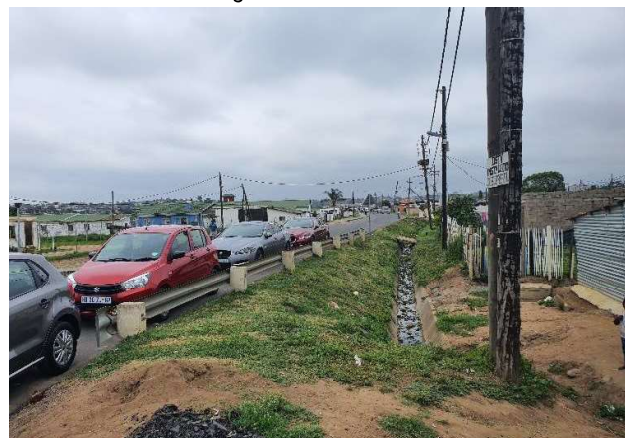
EXISTING STORMWATER CONCRETE LINED CHANNEL
